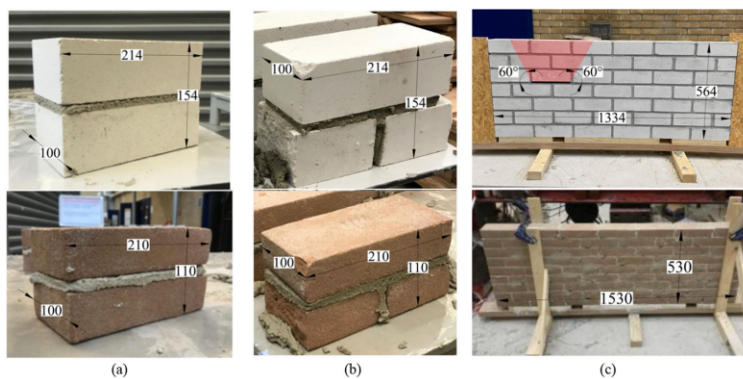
a) stack-bonded couplets, b) running-bonded couplets and c) running-bonded wallets [9].
